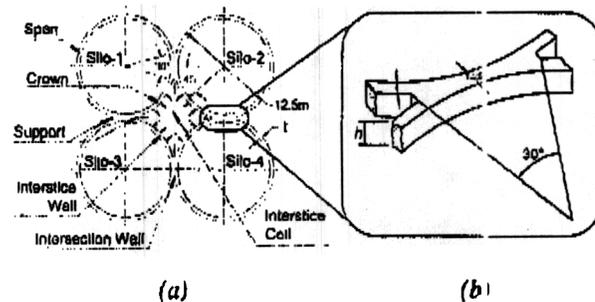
(a) Typical cluster of four silos; and (b) perspective view to intersection wall.
